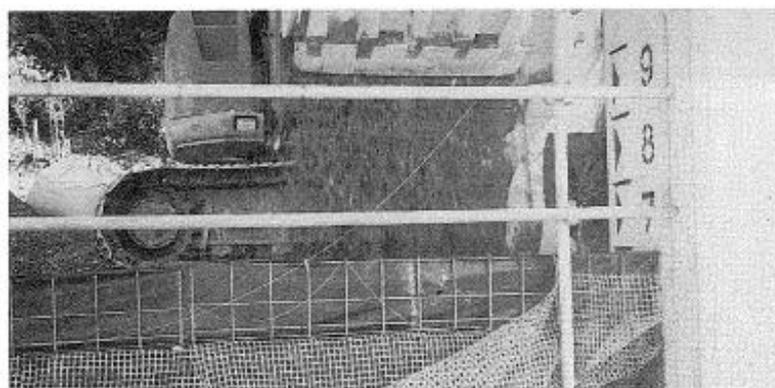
Attachment of geotextile sheet to prevent Spilling out of backfill
